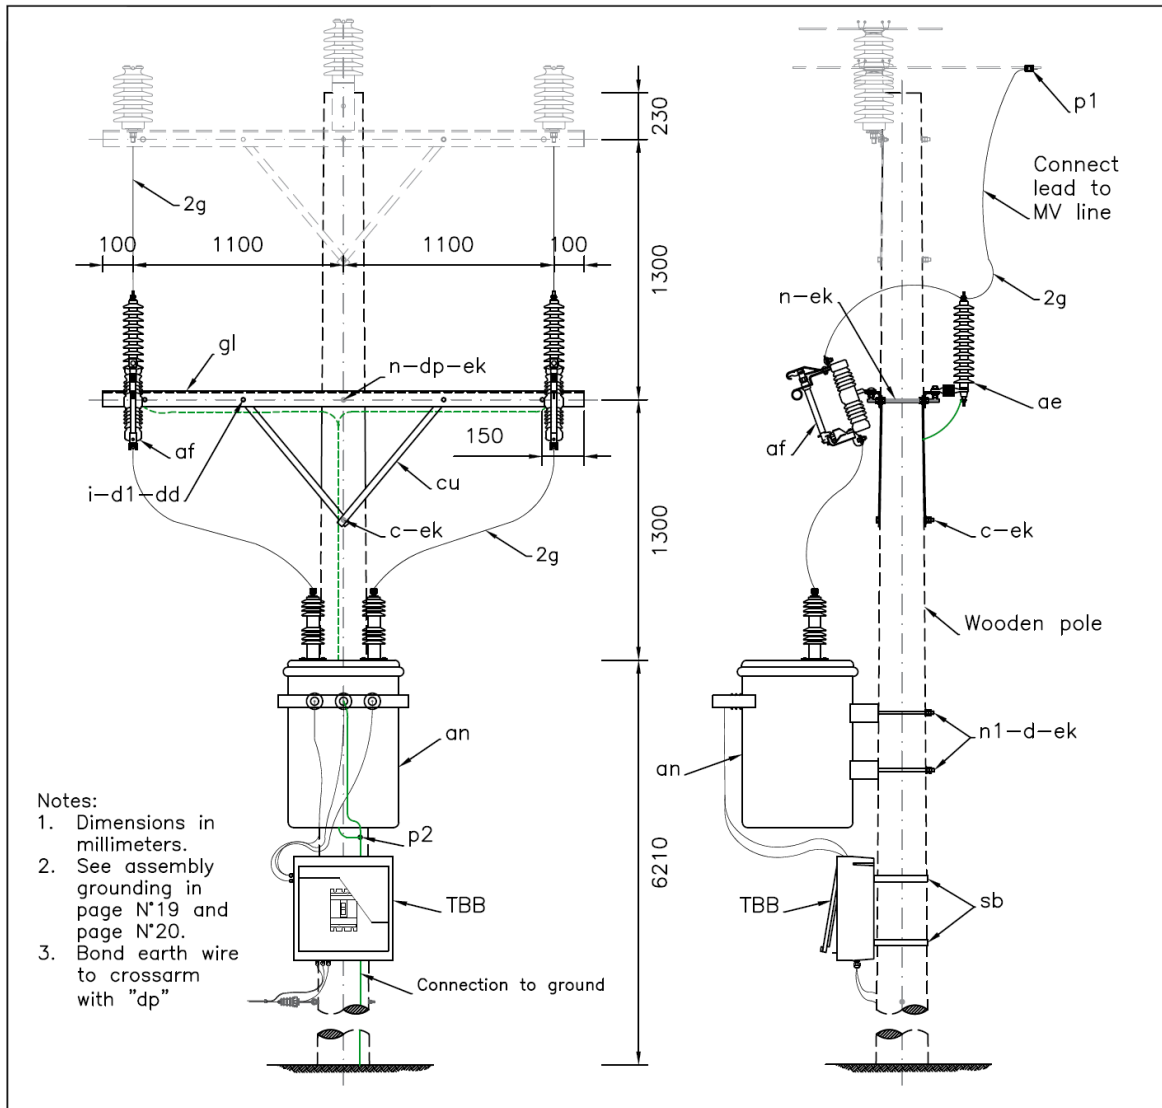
ZM3-3: 30kV Sectionalizing Fuse Cut-out Assemblies
